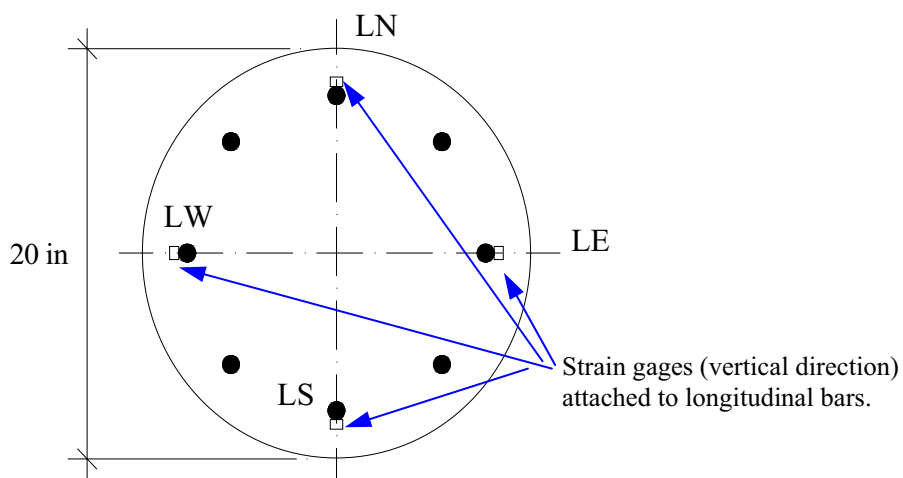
Section B-B; Strain Gages Location on Longitudinal Steel; Specimens A1, A2, A3
